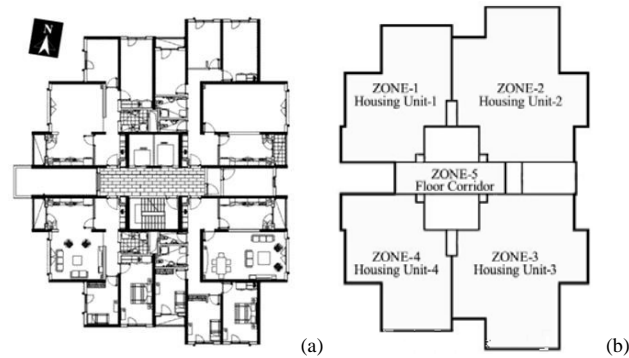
Plan view of the residential building (a) and conditioned zone areas (b).
